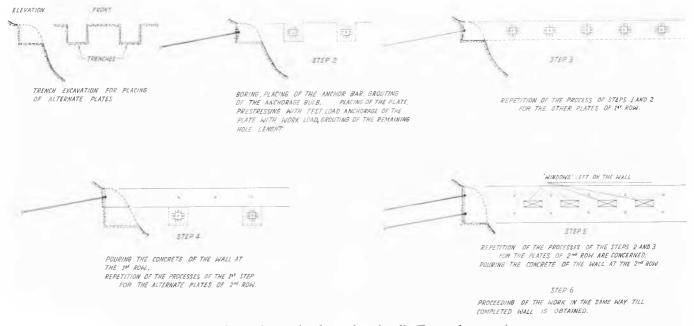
Steps of execution for anchored walls (Tecnosolo system).
